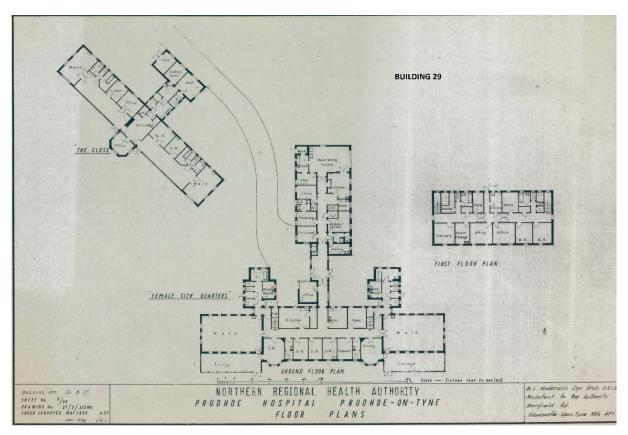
Buildings 29 and 30, Redburn and The Close, historic ground plan
